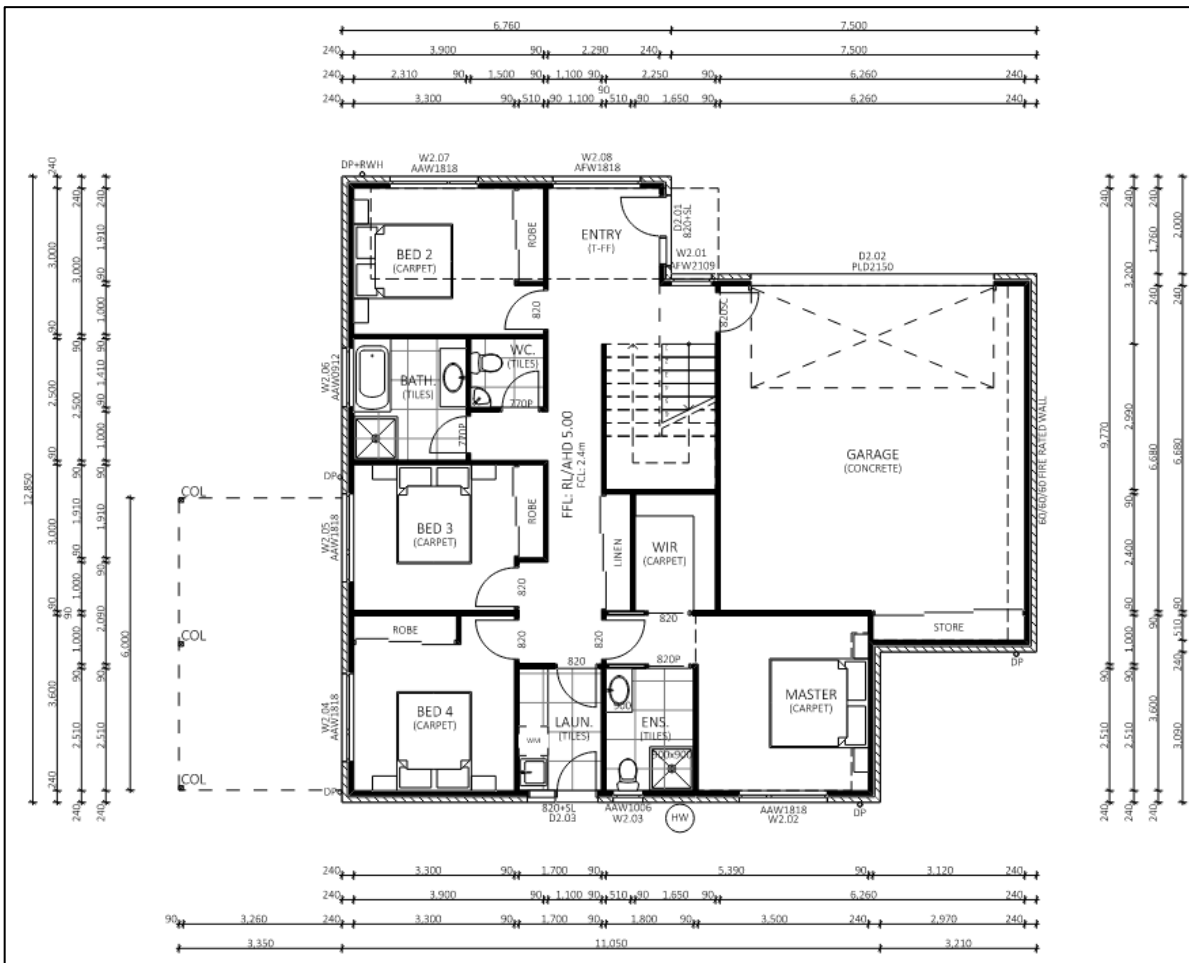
Proposal Plans – Unit 3 – Floor Plan – Ground Floor
